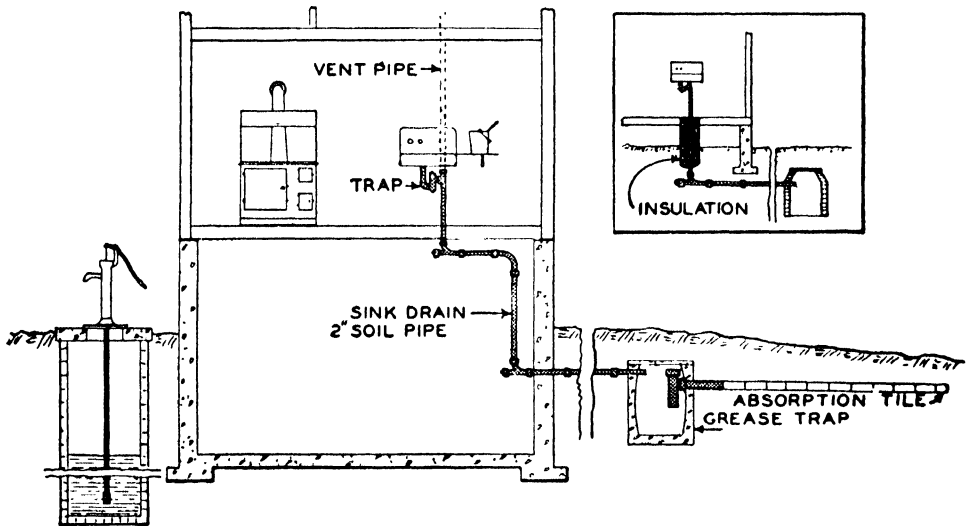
A kitchen sink installation. The trap should be vented as shown by the dotted lines. If not vented, a non-siphoning trap should be used. The insert illustrates a method of insulating the pipe under floor and a cesspool used as an alternate disposal system suitable where the soil is porous.
